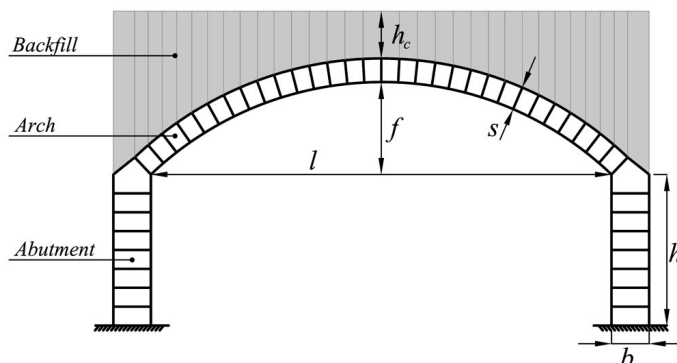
Nomenclature and geometry of the masonry arch bridge.
